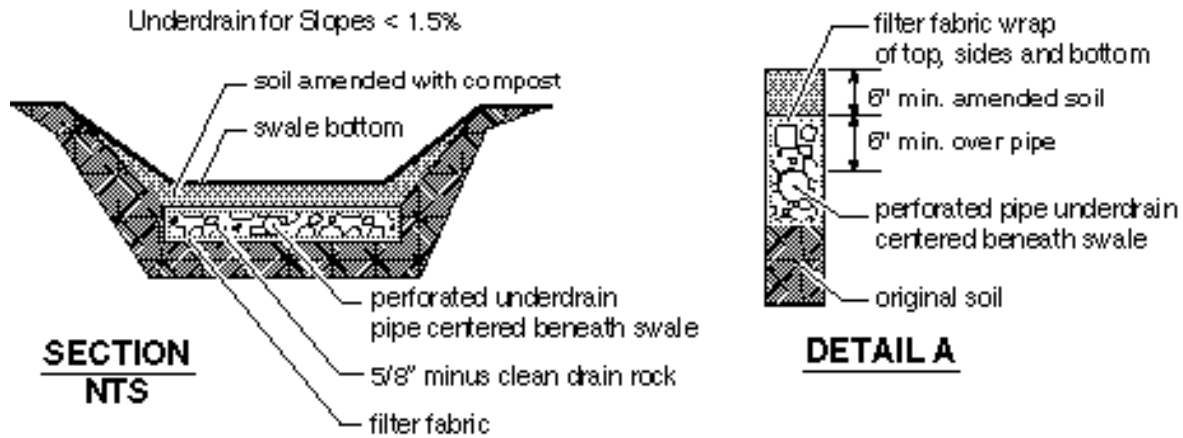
BIOFILTRATION SWALE UNDERDRAIN DETAIL
